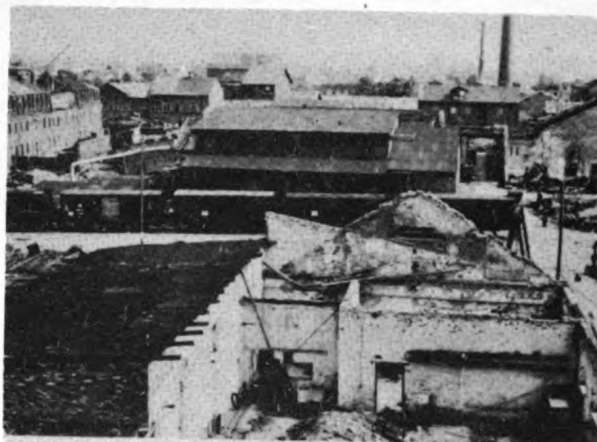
View looking east, showing debris cleared bldg. Blast and fire destroyed wood framing of roof. Bldg. 57 in background.
